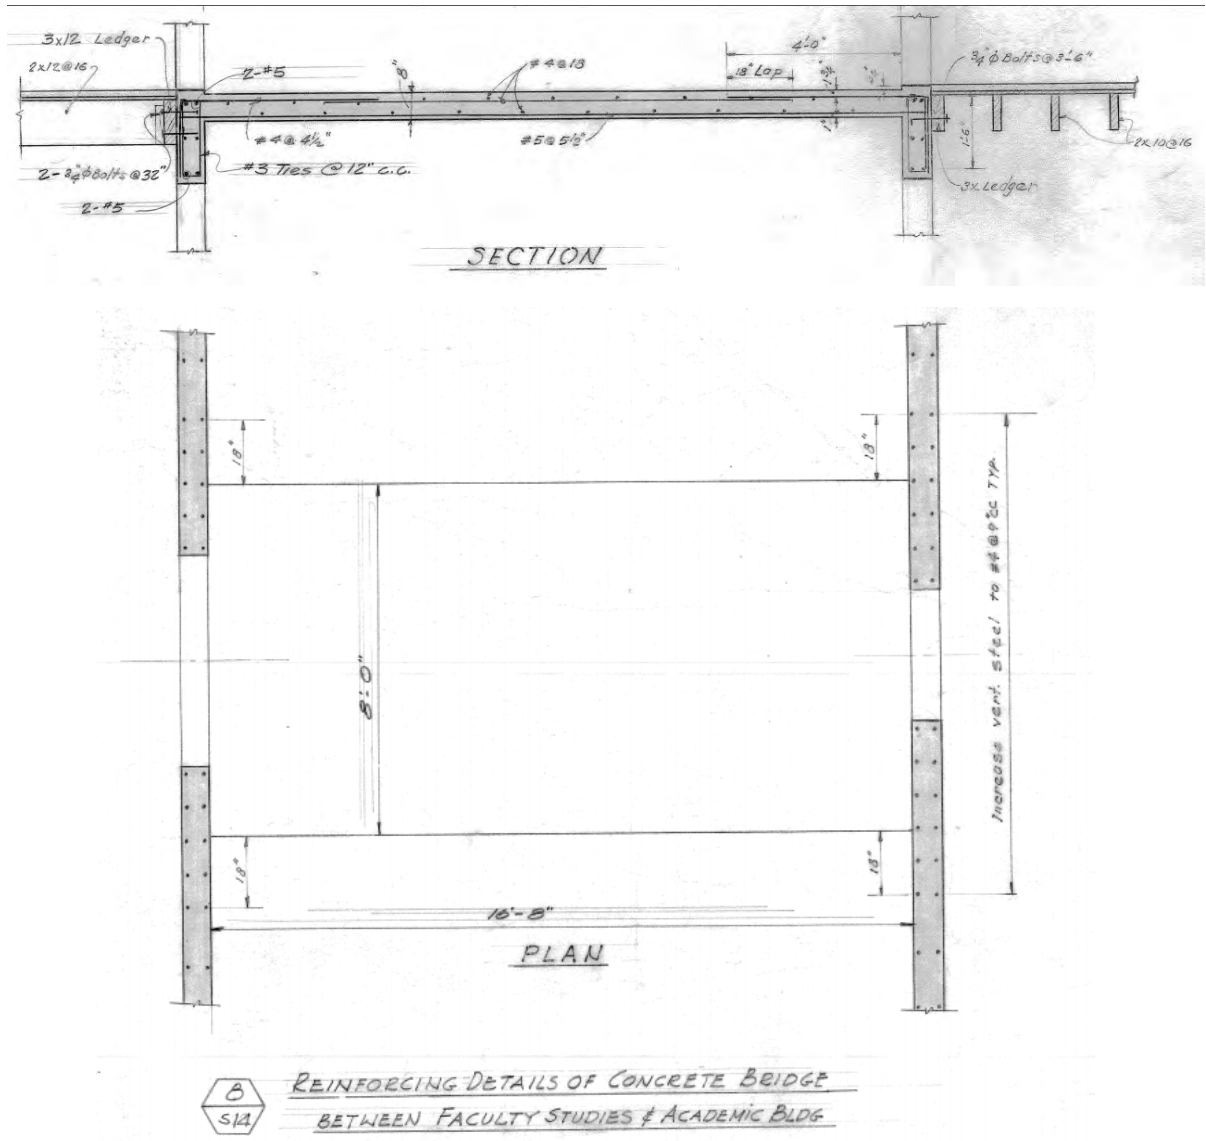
Detail 8/S14 - Concrete Bridge Section Detail
